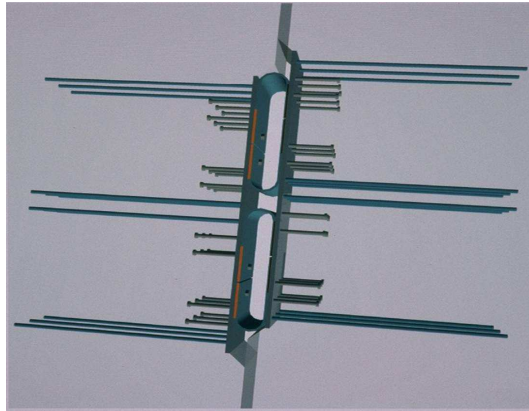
U –plate connecting panels through embedded plates in adjacent panels (Ductile Connection)
